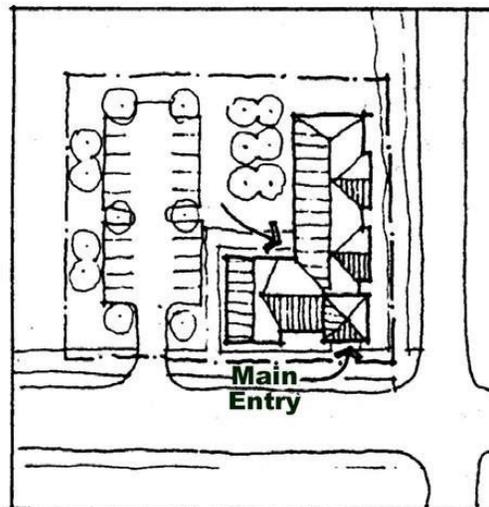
All buildings should be sited and have building elements, like entries, that relate to the street. Entries to buildings should not just be from parking lots.
